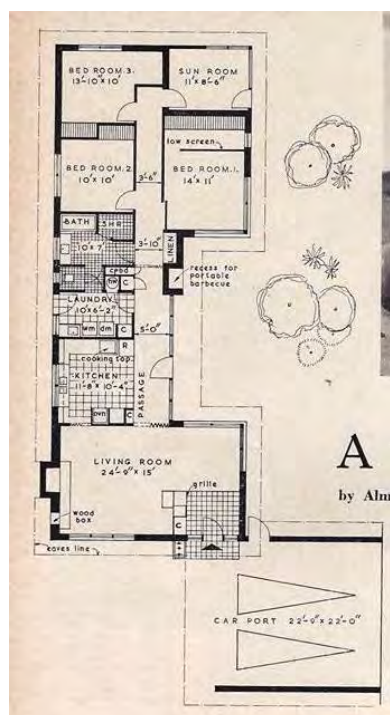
Site plan of the house at 89 Oak Street. North is to the right of the image (Source: *Australian House and Garden*, June 1966)
